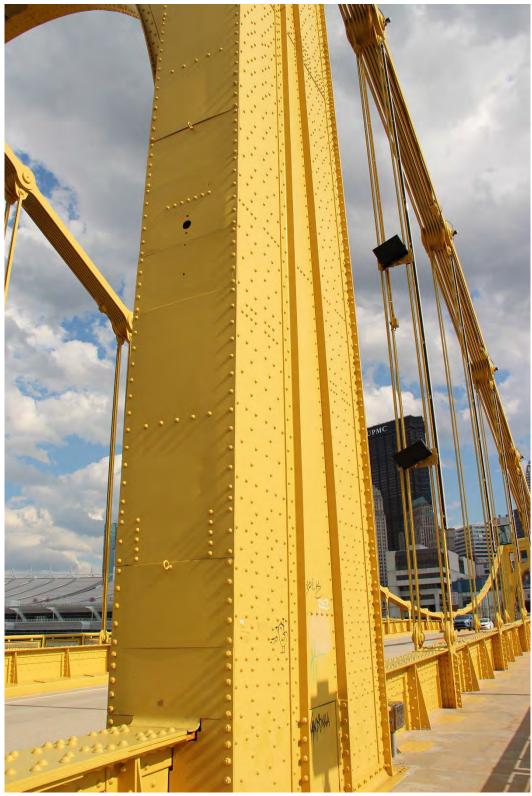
Rachel Carson Bridge (April 2024), detail of north tower showing battered design and built-up, riveted construction, facing southeast.
